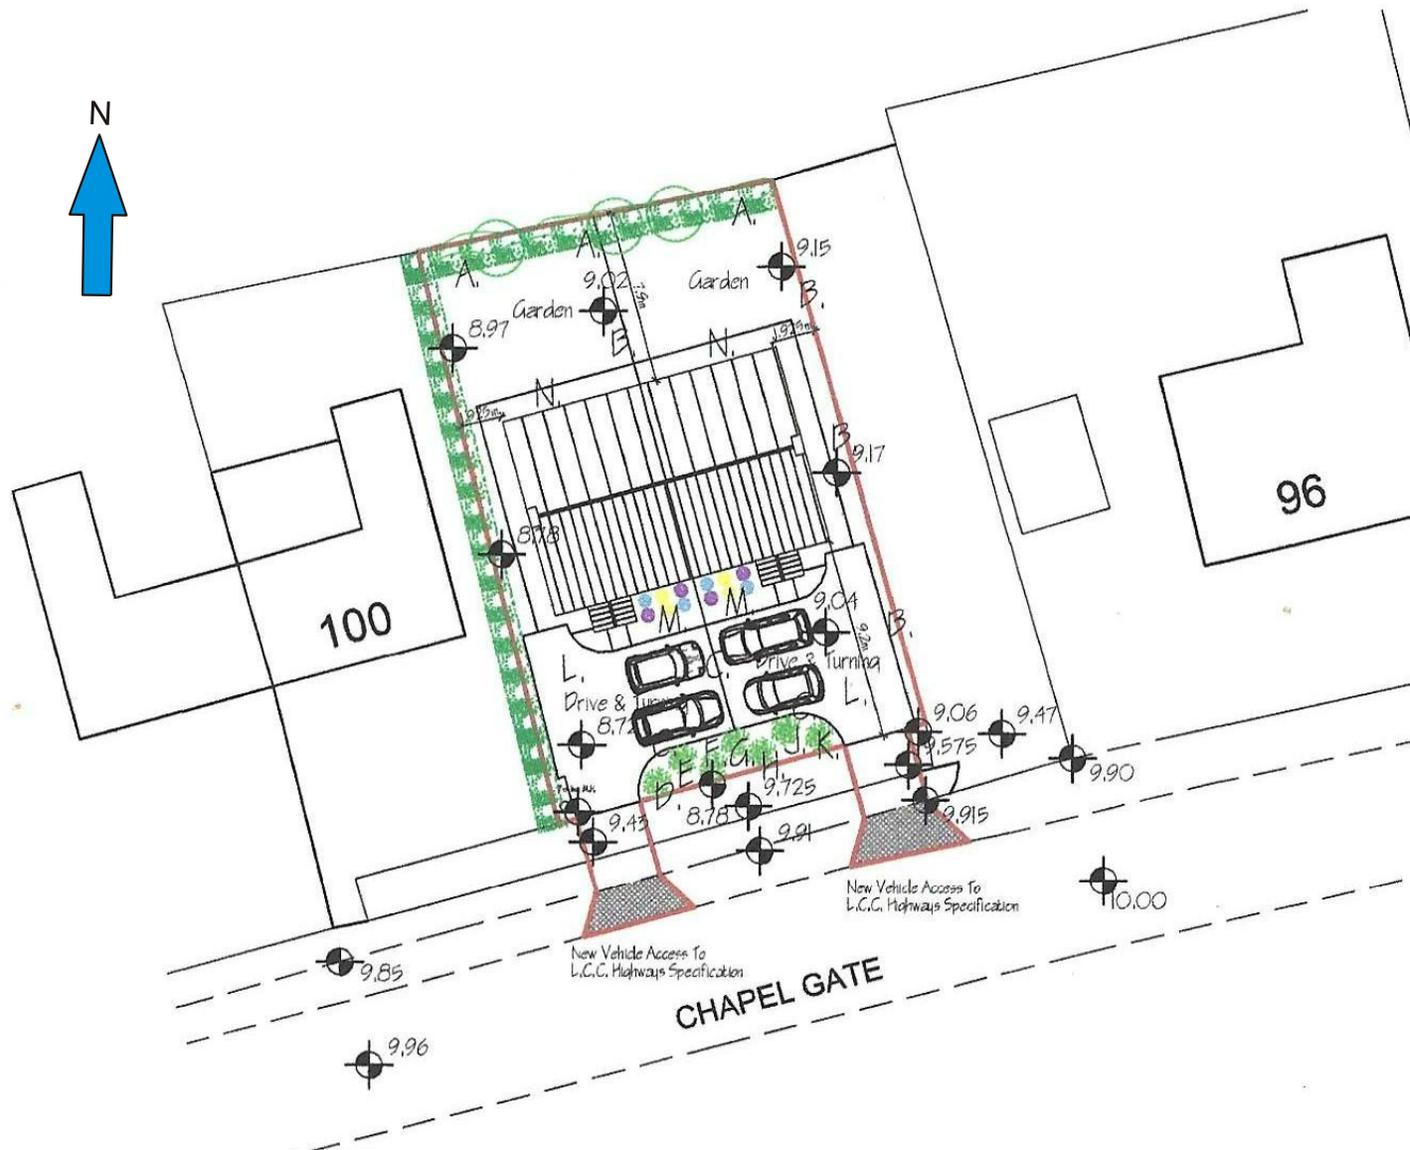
Block plan showing the proposed layout of the development site at an original scale of 1:200, (extract from Architects plan)
